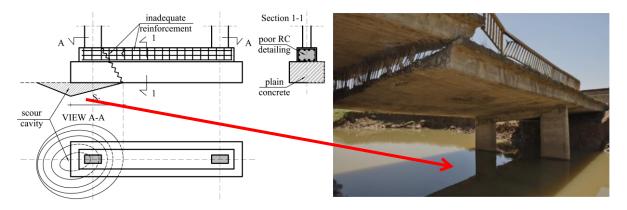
A brittle failure governed by poor foundation detailing (Tanasic, 2015)
